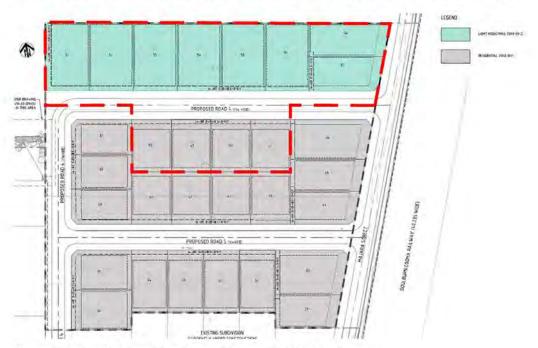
Majara St, Bungendore, Lots 3-4 Proposed Subdivision Layout
